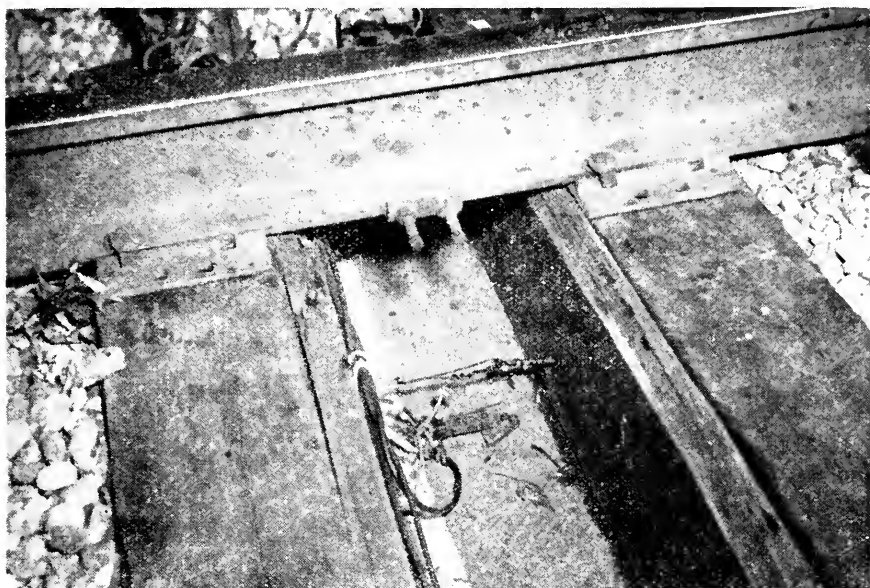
Electro-magnetic gage on top of reinforced concrete slab between ties.
